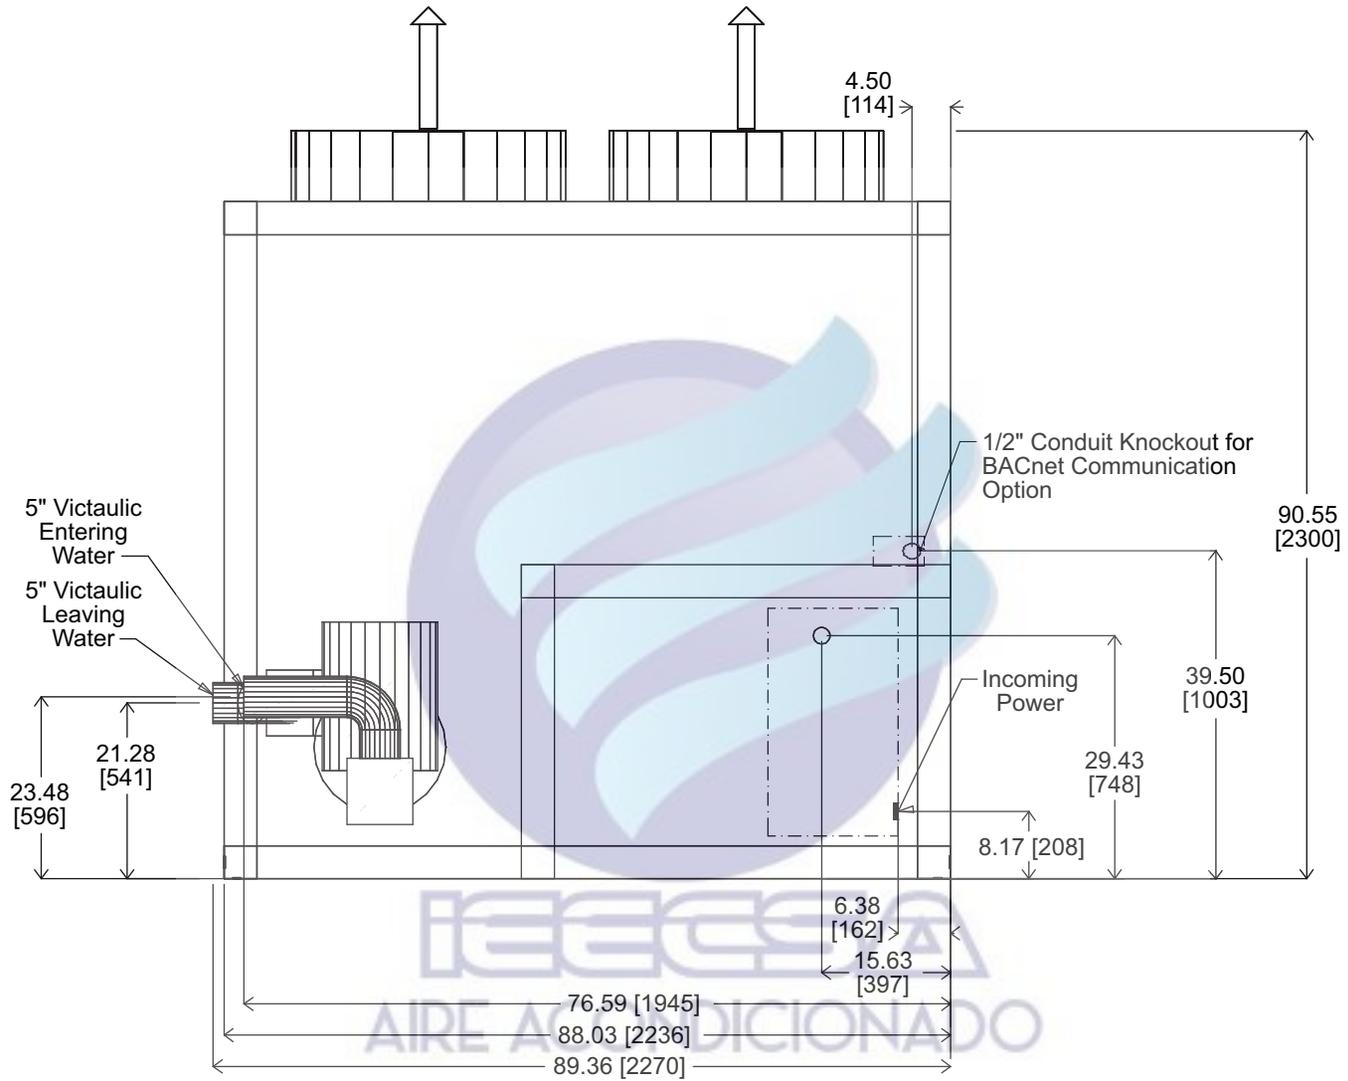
30XA140,160 Air-Cooled Liquid Chiller Dimensions with Single Pump (cont)
